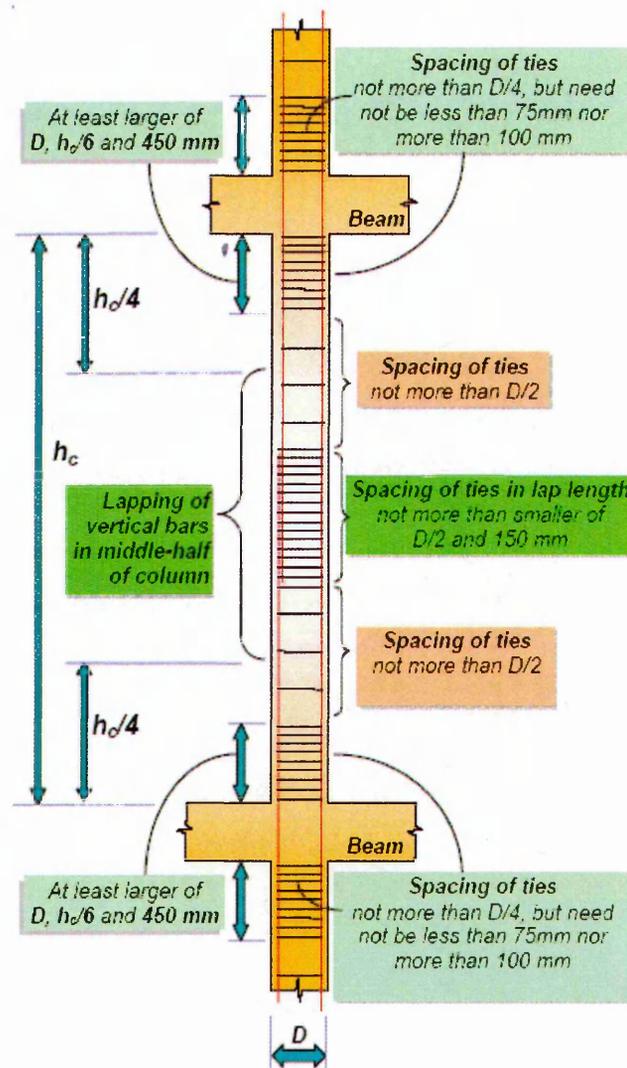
Placing vertical bars and closed ties in columns; column ends and lap lengths are to be protected with closely spaced ties (IITK-BMTPC, 2003)
